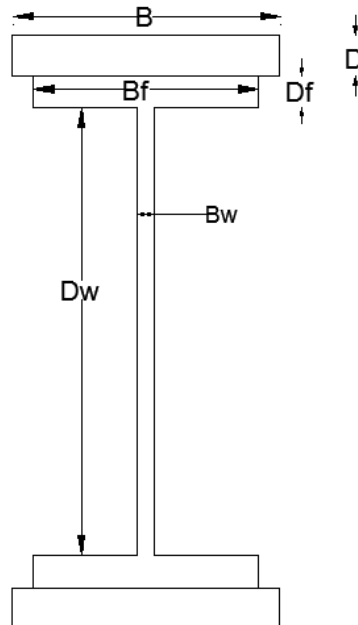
Schematic of Plated I-section of a Steel Bridge Pier.
